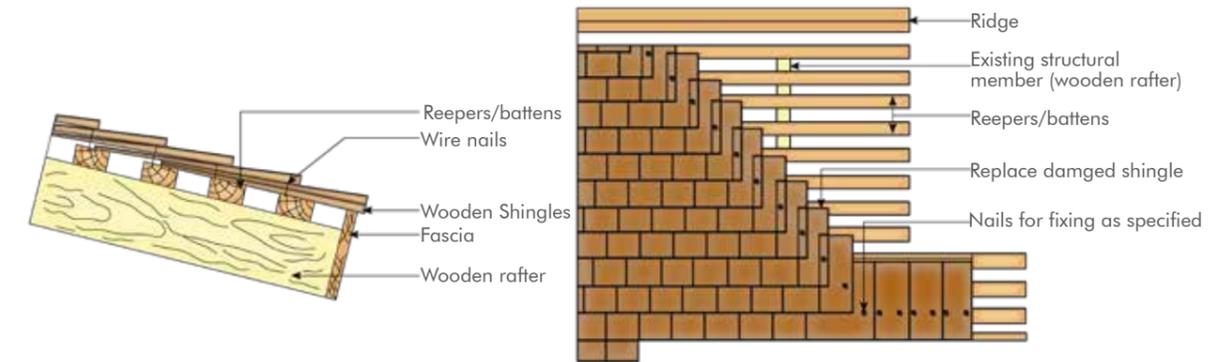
Detail of Wooden Shingles, Source: IS:2700-1987
